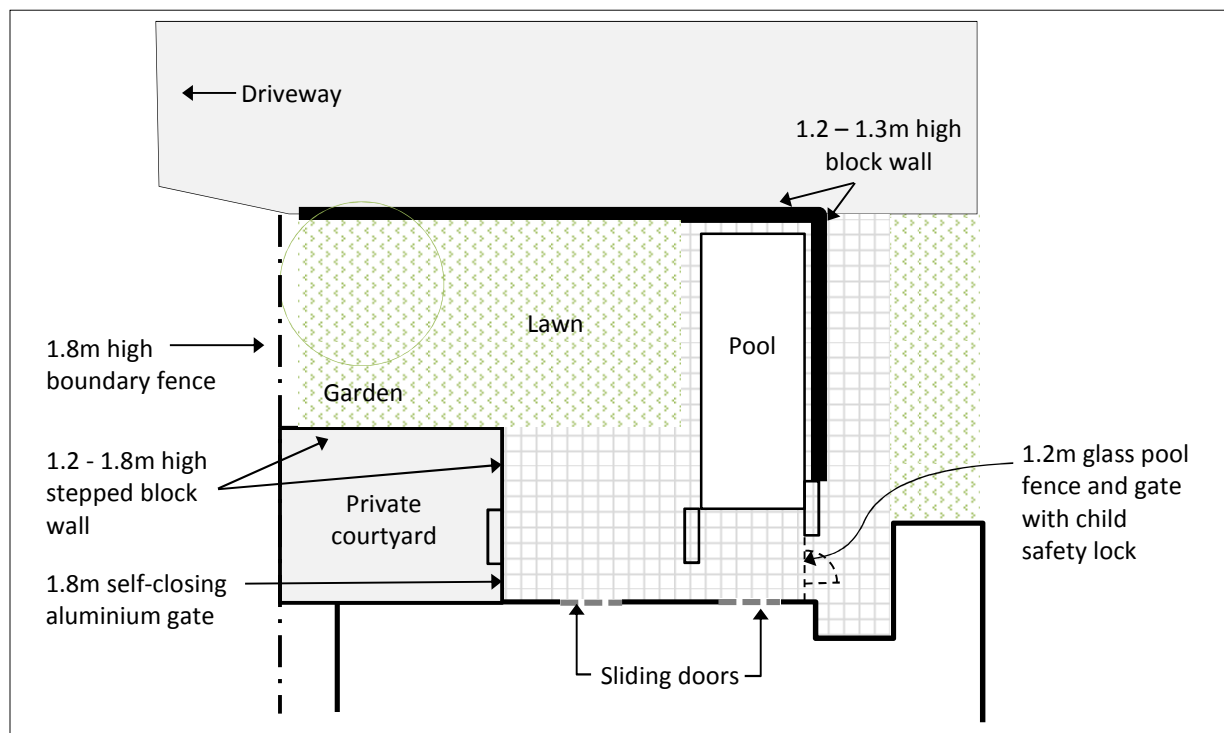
Plan showing elements that make up the pool barrier and the area enclosed as the immediate pool area
